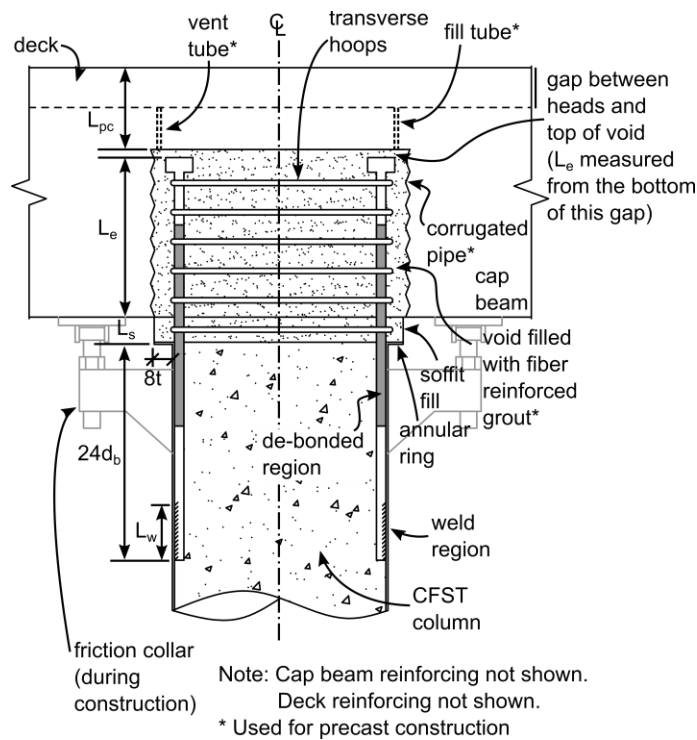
Welded Dowel Connection with De-bonded Reinforcing
